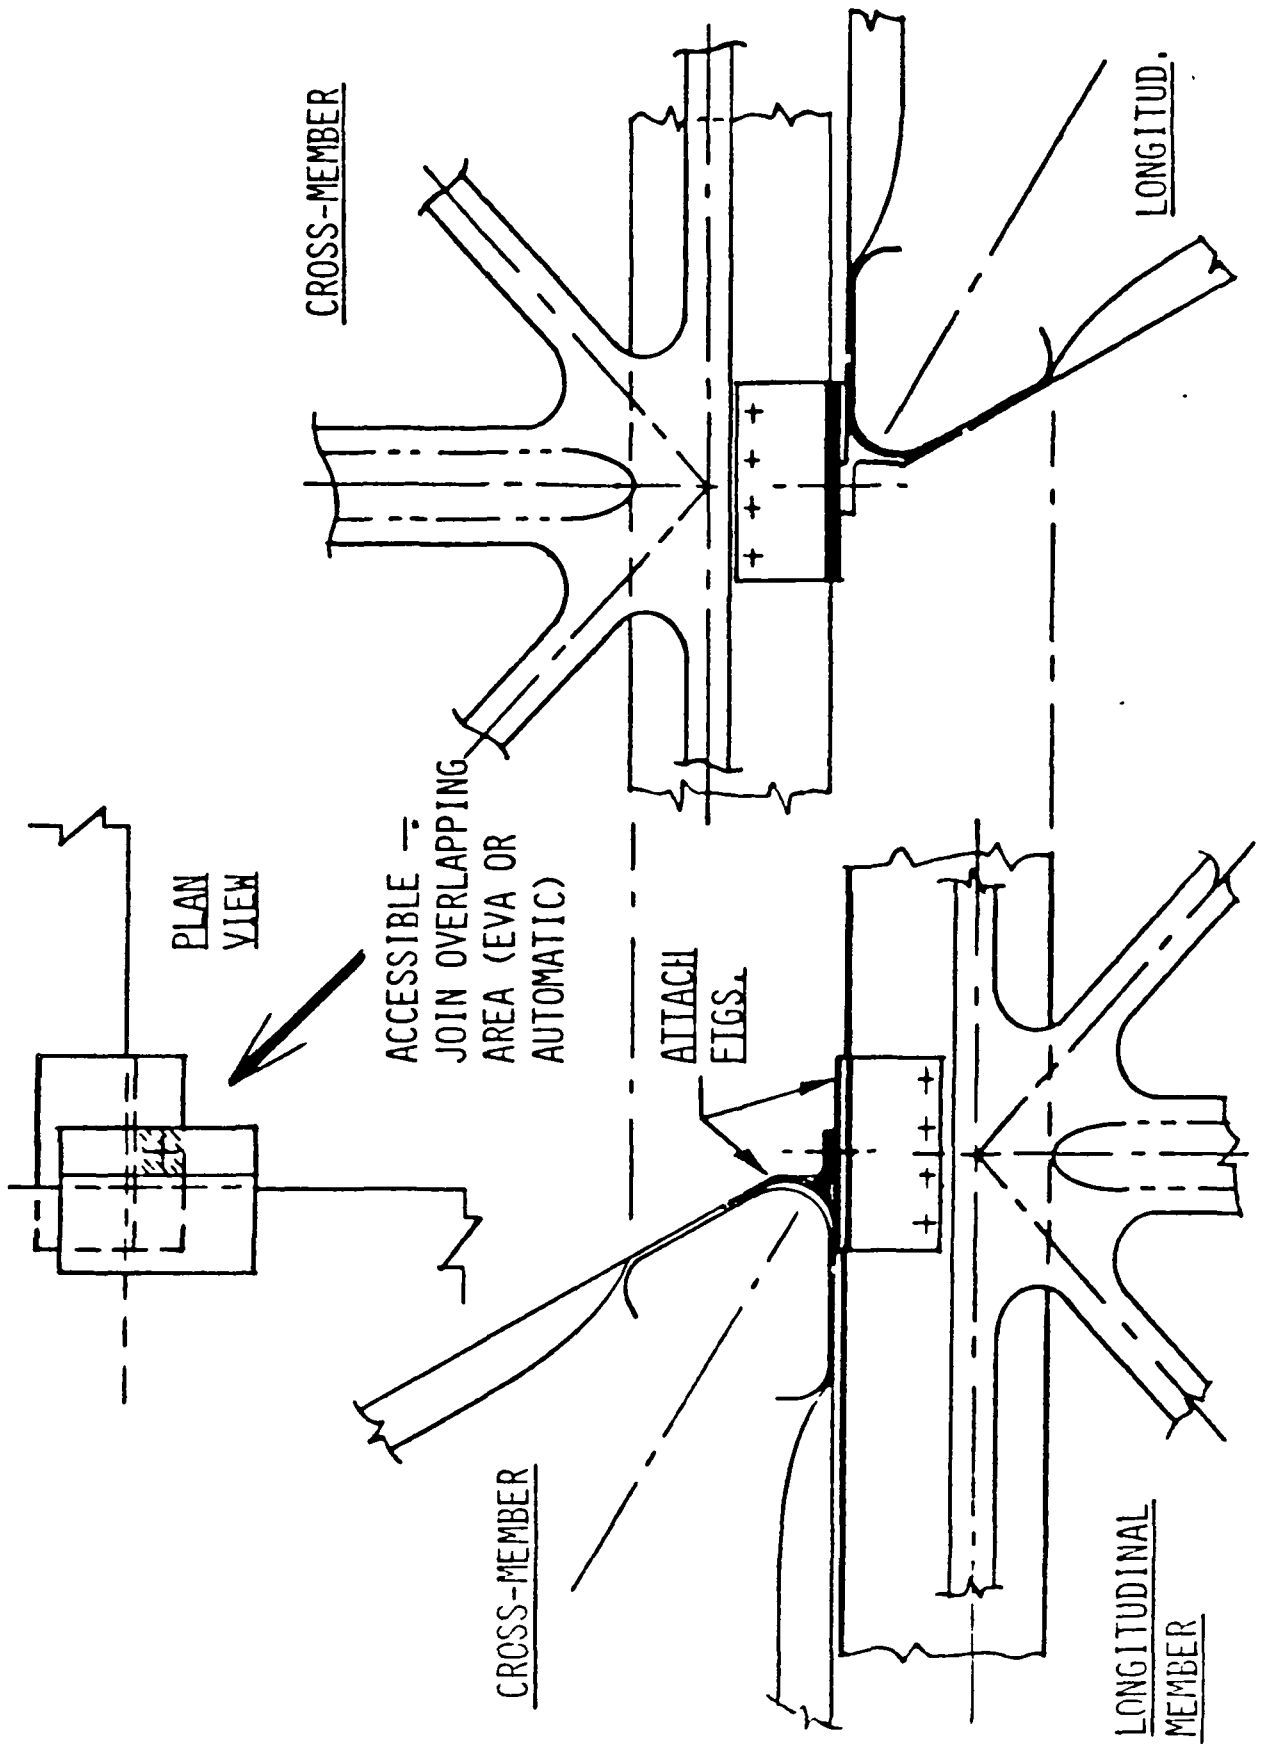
CONCEPT FOR JOINING BEAMS
